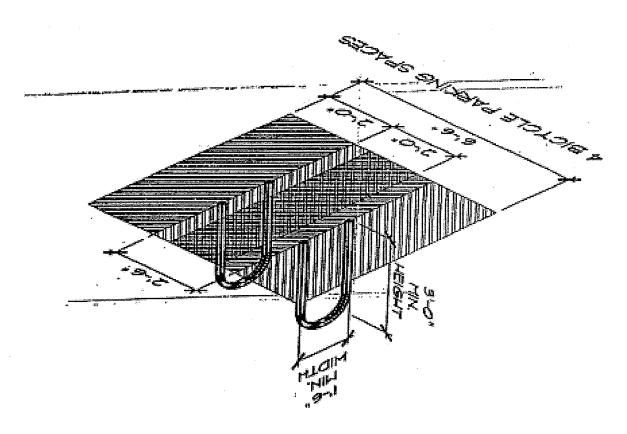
Two racks spaced 2 feet 6 inches on center and equaling 4 parking spaces.
